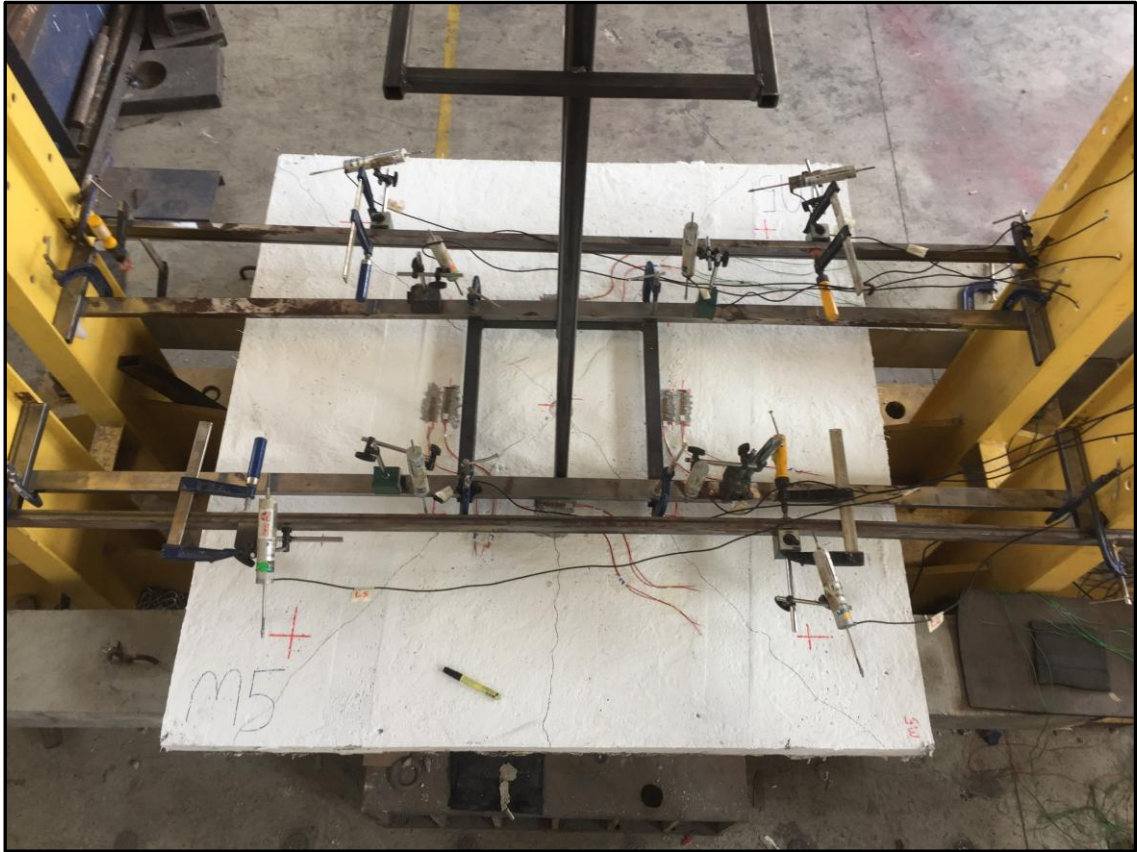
Final Crack Patterns for Impact Test Specimen M5
